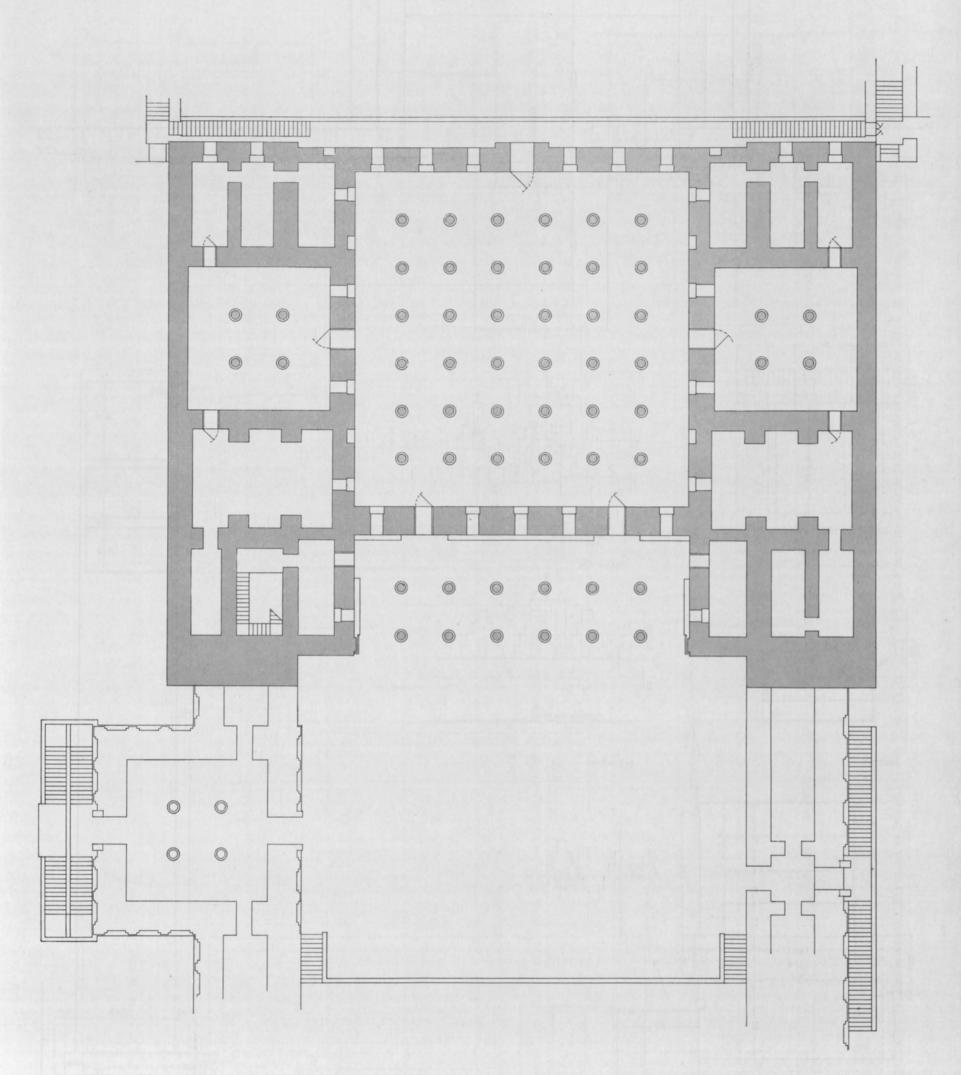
Reconstructed Plan of Palace of Xerxes. Scale, 1:300
